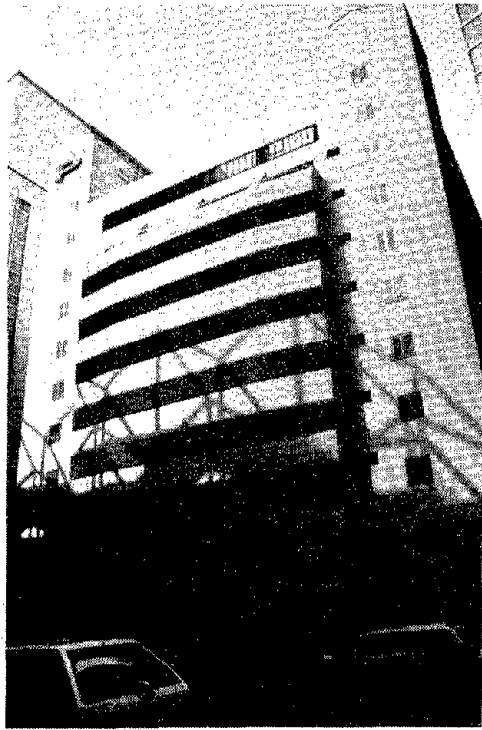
Elevation of a modern, six-story, steel-braced parking structure
